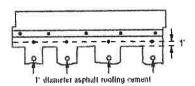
Fastering Presidential and Presidential 1/L Shake shingles on steep slopes.
